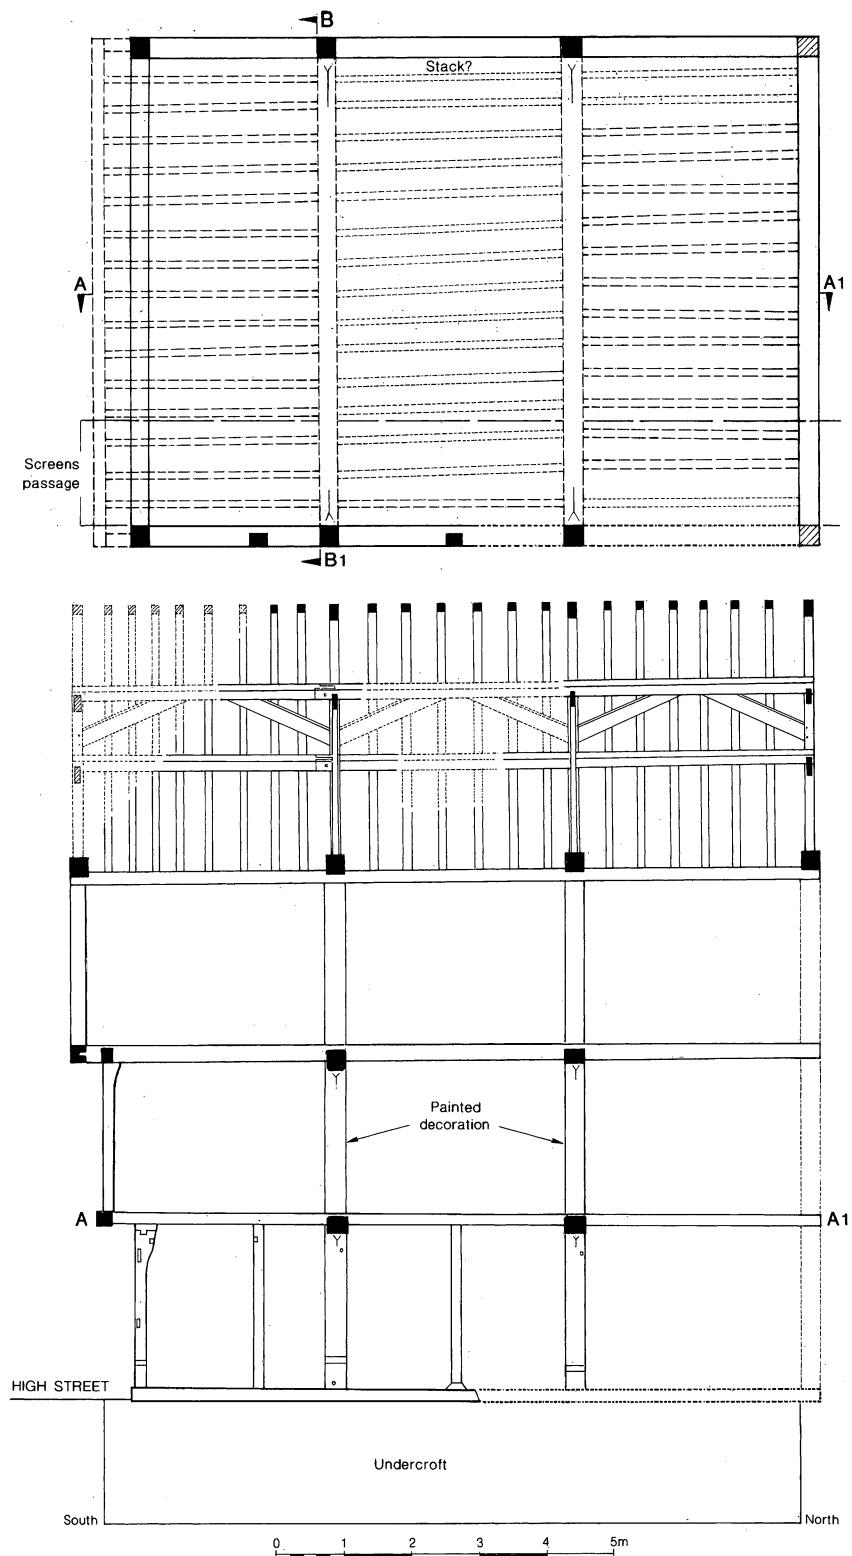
(*opposite page*) 137/139 High Street, Guildford: Ground-floor plan and long section. Dashed lines show first-floor framing; dotted lines show framing which has been removed.
